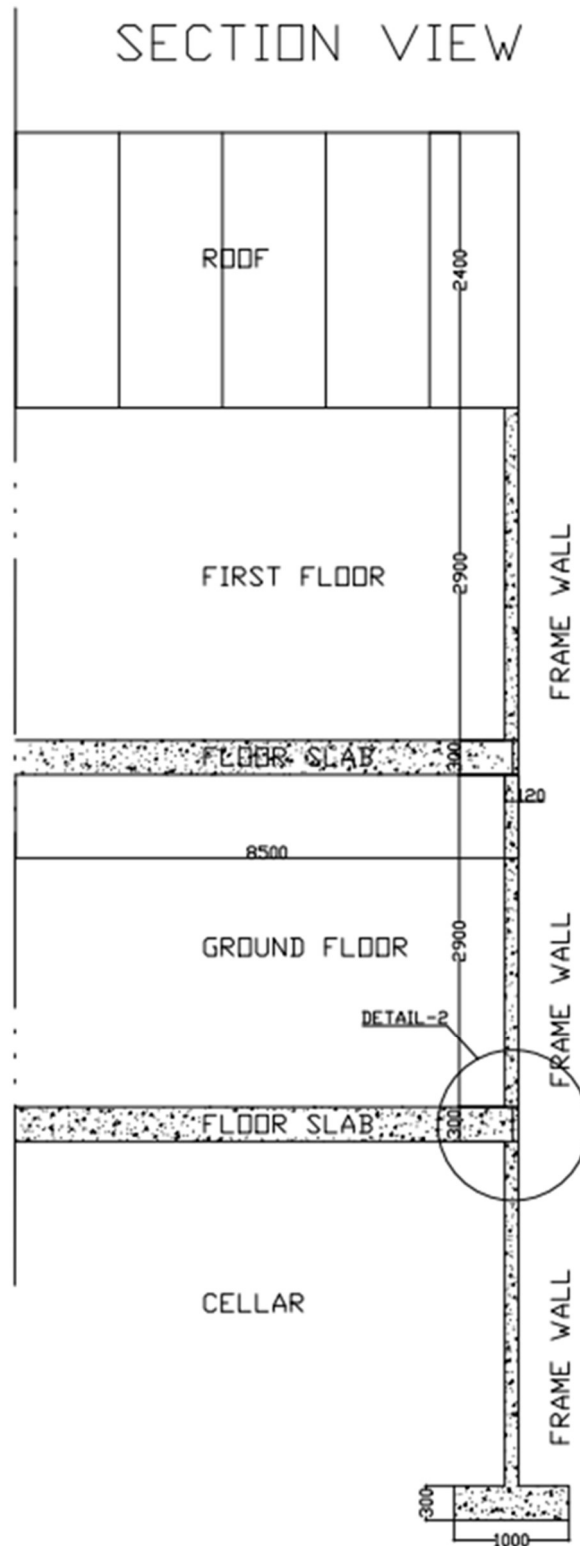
Section of the building with detailed dimensions applied to the load bearing external wall
